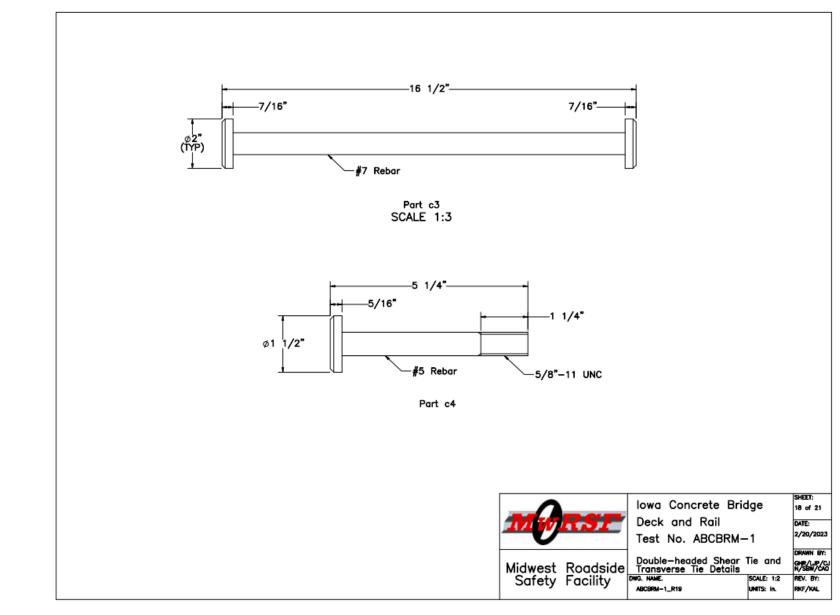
Double-Headed Shear Tie and Transverse Tie Details, Test No. ABCBRM-1
